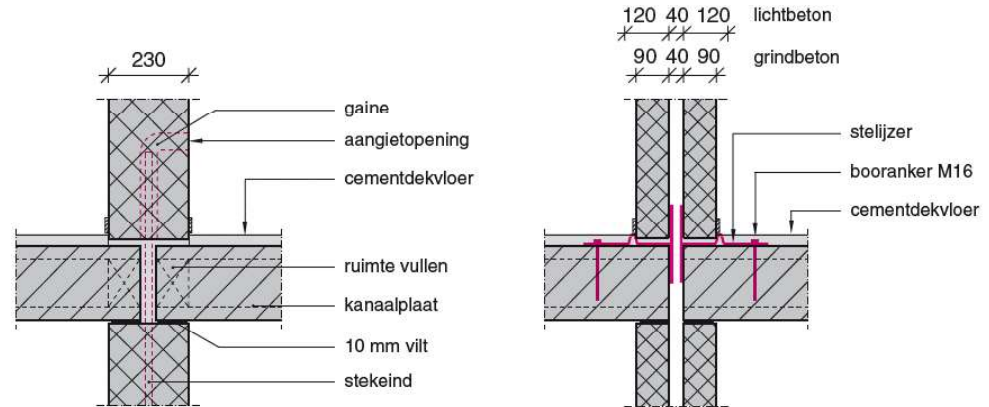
Wall-floor connections; adapted from [Jellema, 2004].
